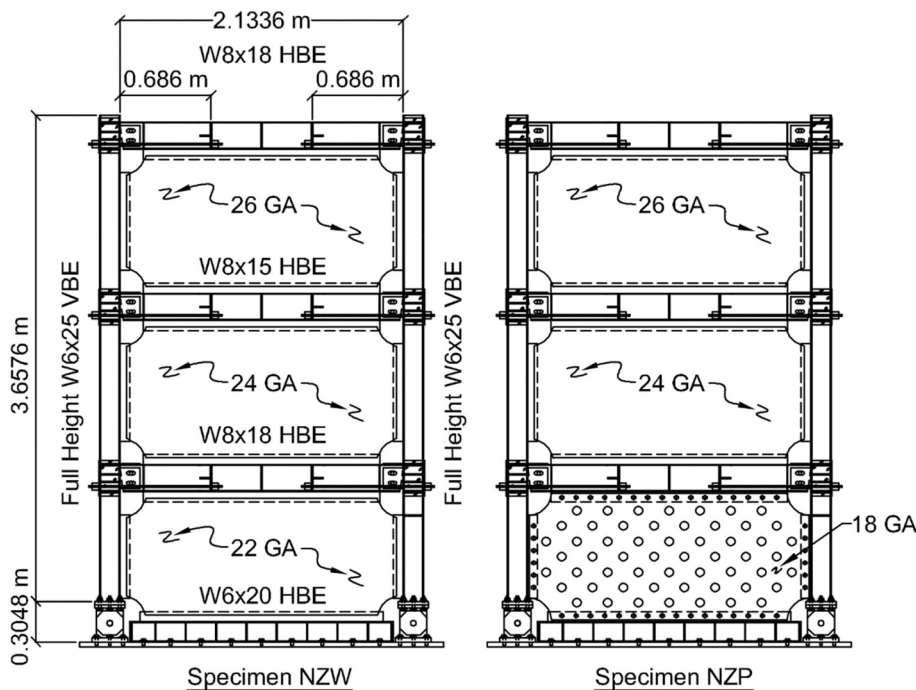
Three-story steel plate shear wall test specimens: solid and welded infill panels at every level (NZW) and specimen with perforated and bolted web panel at the first level (NZP).
